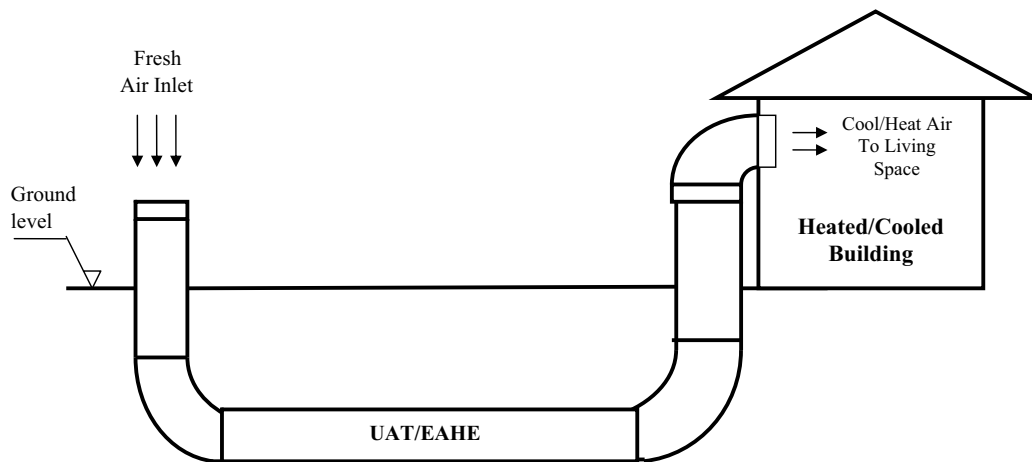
Schematic of open loop EAHE (underground air tunnel).
